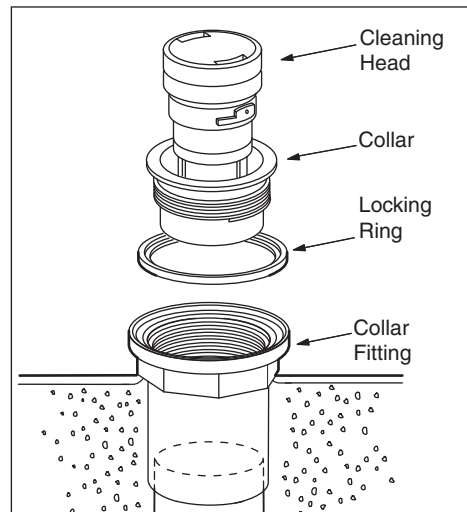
Cleaning Head and Collar Installation in a Vinyl Liner Pool
